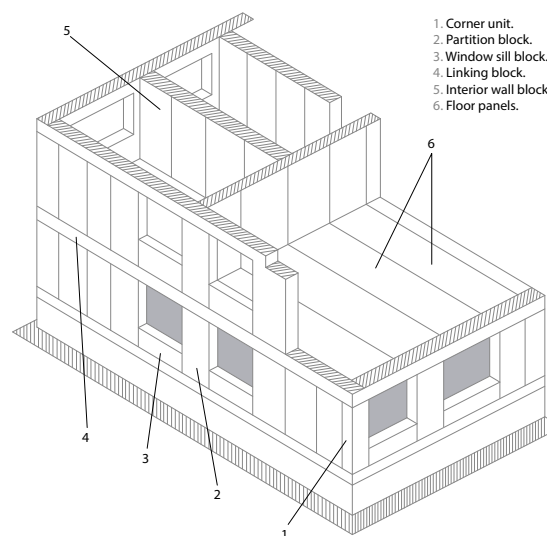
Structural scheme of large-block building with the transverse and longitudinal load-bearing walls (based on [28])
